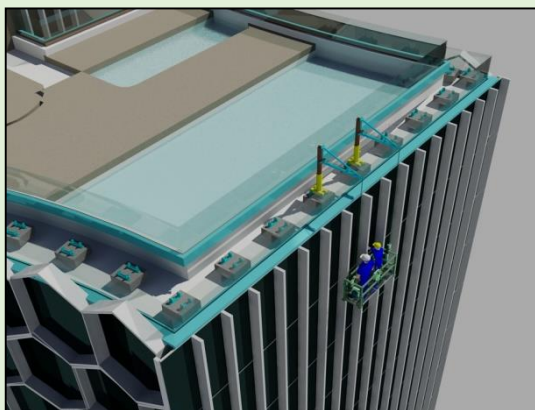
Maximum façade coverage through sufficient spacing of hoisting facilities and anchorage points for suspended platforms
